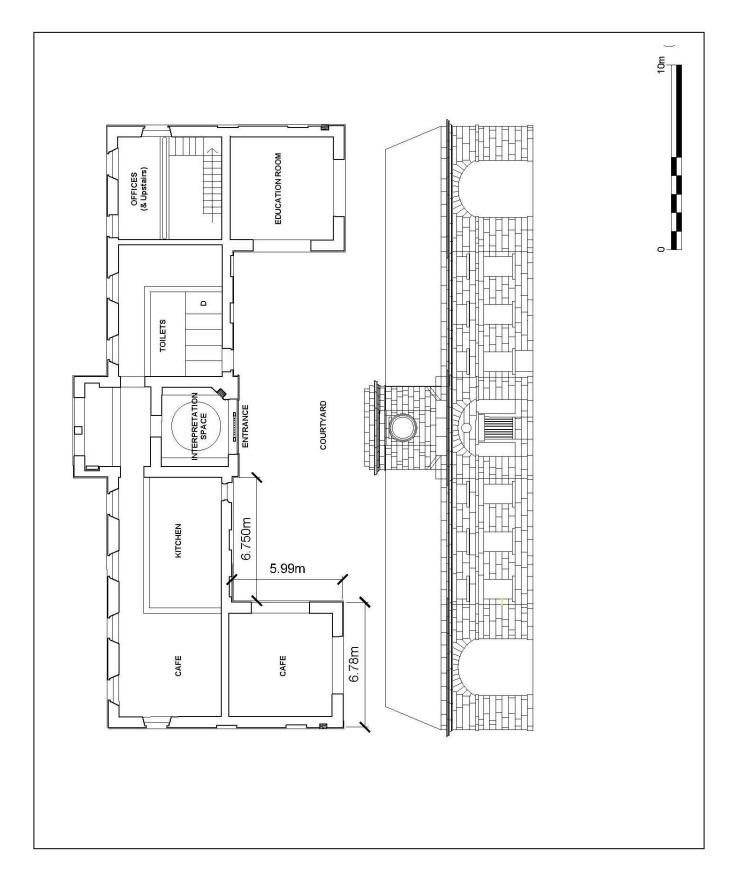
Stable Block Current Layout and Elevation (Source: Paul Hogarth)
